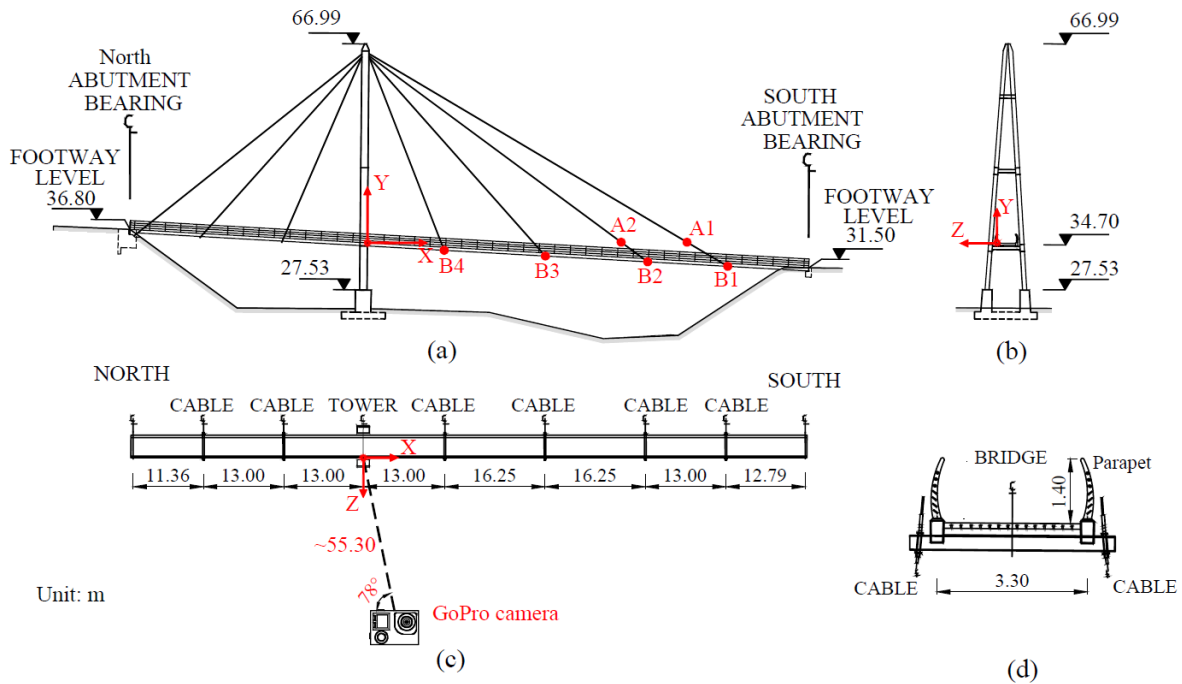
Baker Bridge information and the sensor locations: (a) the west elevation of the bridge with the marked locations of six wireless accelerometer sensors APDM Opal™ (B1~4, A1~2); (b) the tower elevation of the bridge; (c) the deck plan of the bridge with the marked location of the GoPro camera in the west side; and (d) a typical deck section of the bridge.
